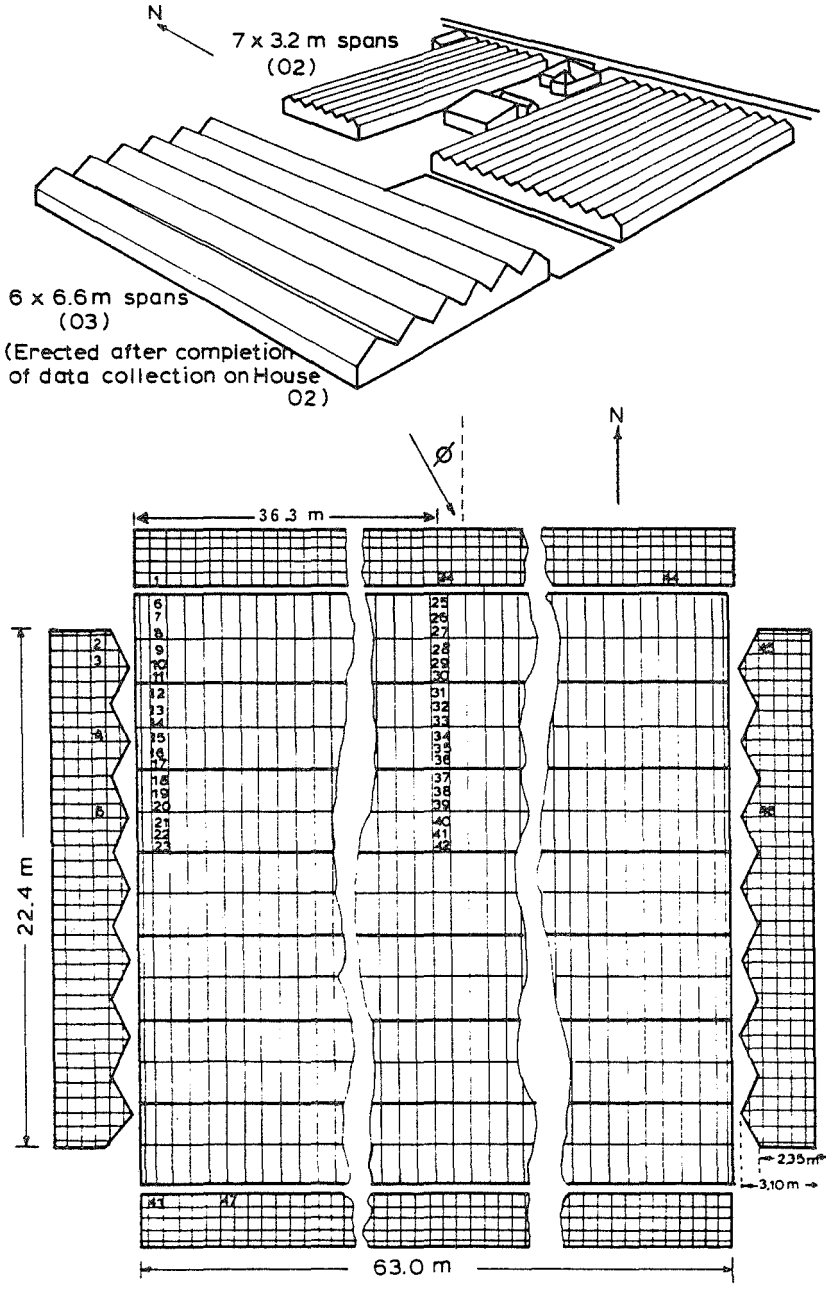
Site plan for houses 02 and 03 with tapping point plan for house 02.
